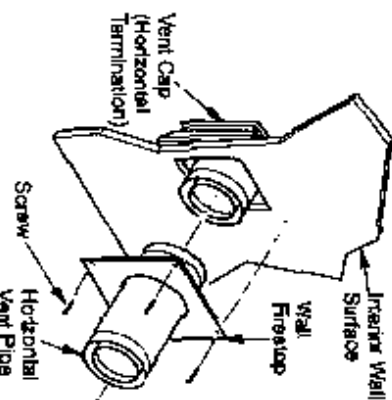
Connecting Vent Cap with Horizontal Vent Pipe
